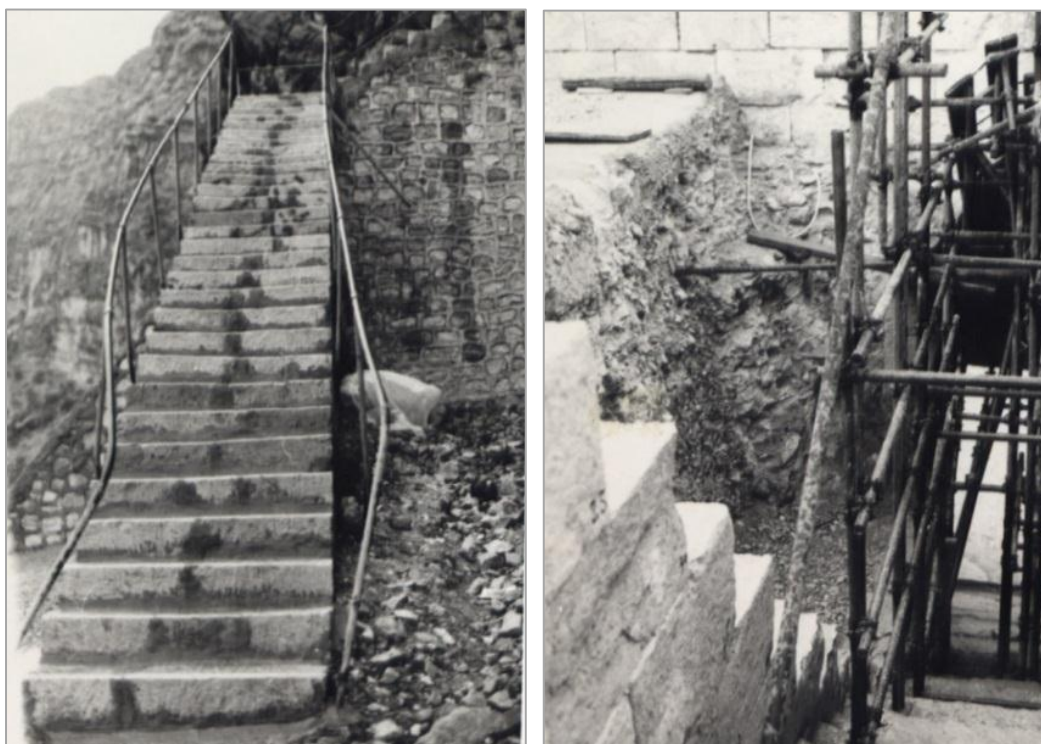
Right: stone stairs for cave accessibility. Left: restoration of *Anahita* temple's stairs. 1987. Center of heritage documents.
